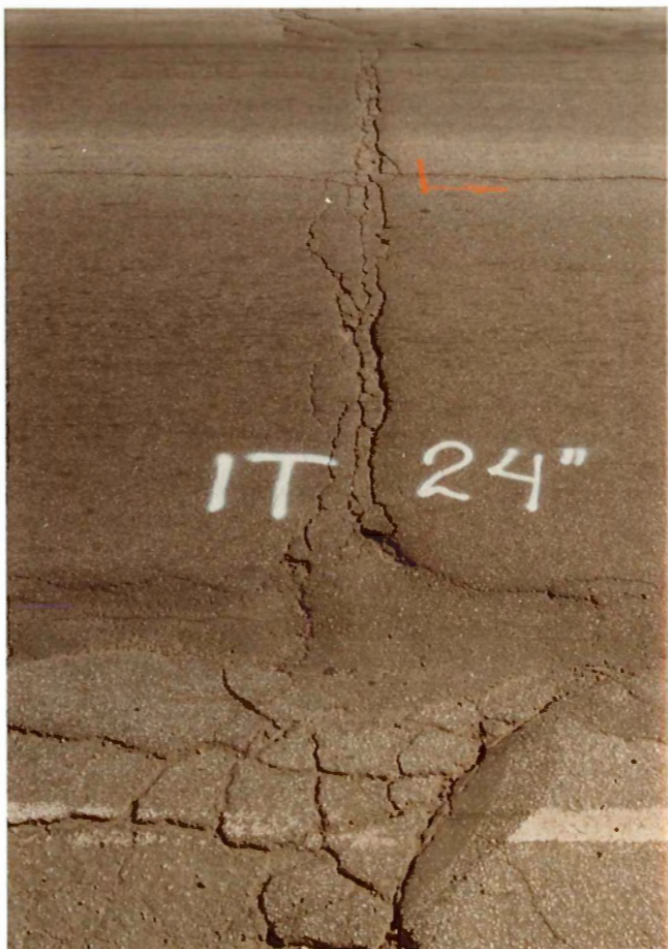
shows a typical full width transverse crack prior to treatment with 24 inch wide fabric.
